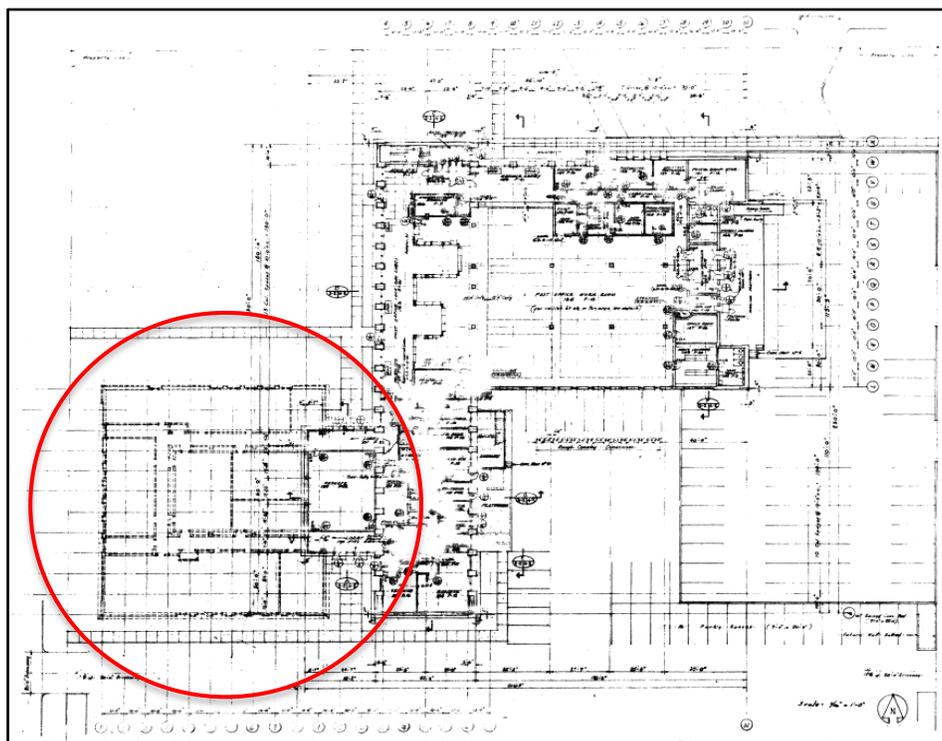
First floor plan of Federal Building with proposed courthouse wing circled in red.³⁹
